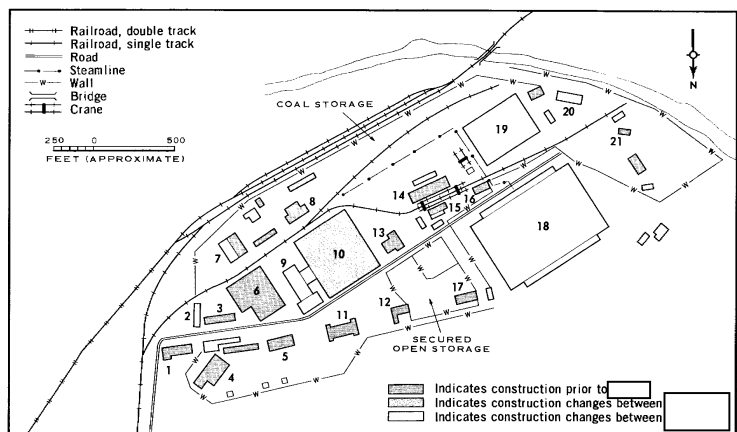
LAYOUT OF LENINGRAD AIRFRAME PLANT 458.
